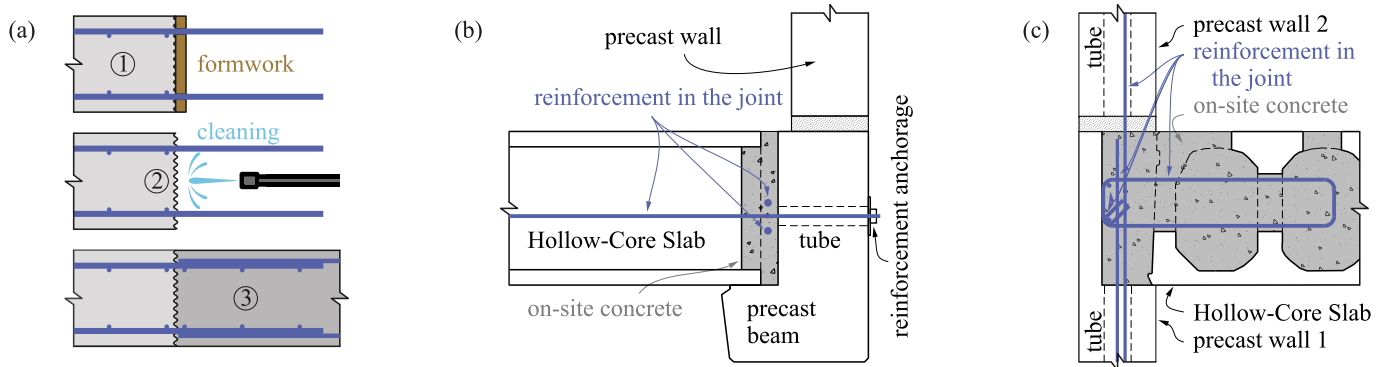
Details of connections in on-site and prefabricated construction: (a) Typical processing steps for an on-site construction joint; (b) typical connection of a Hollow-Core Slab to a precast beam; (c) typical connection of a Hollow-Core Slab to a wall.
